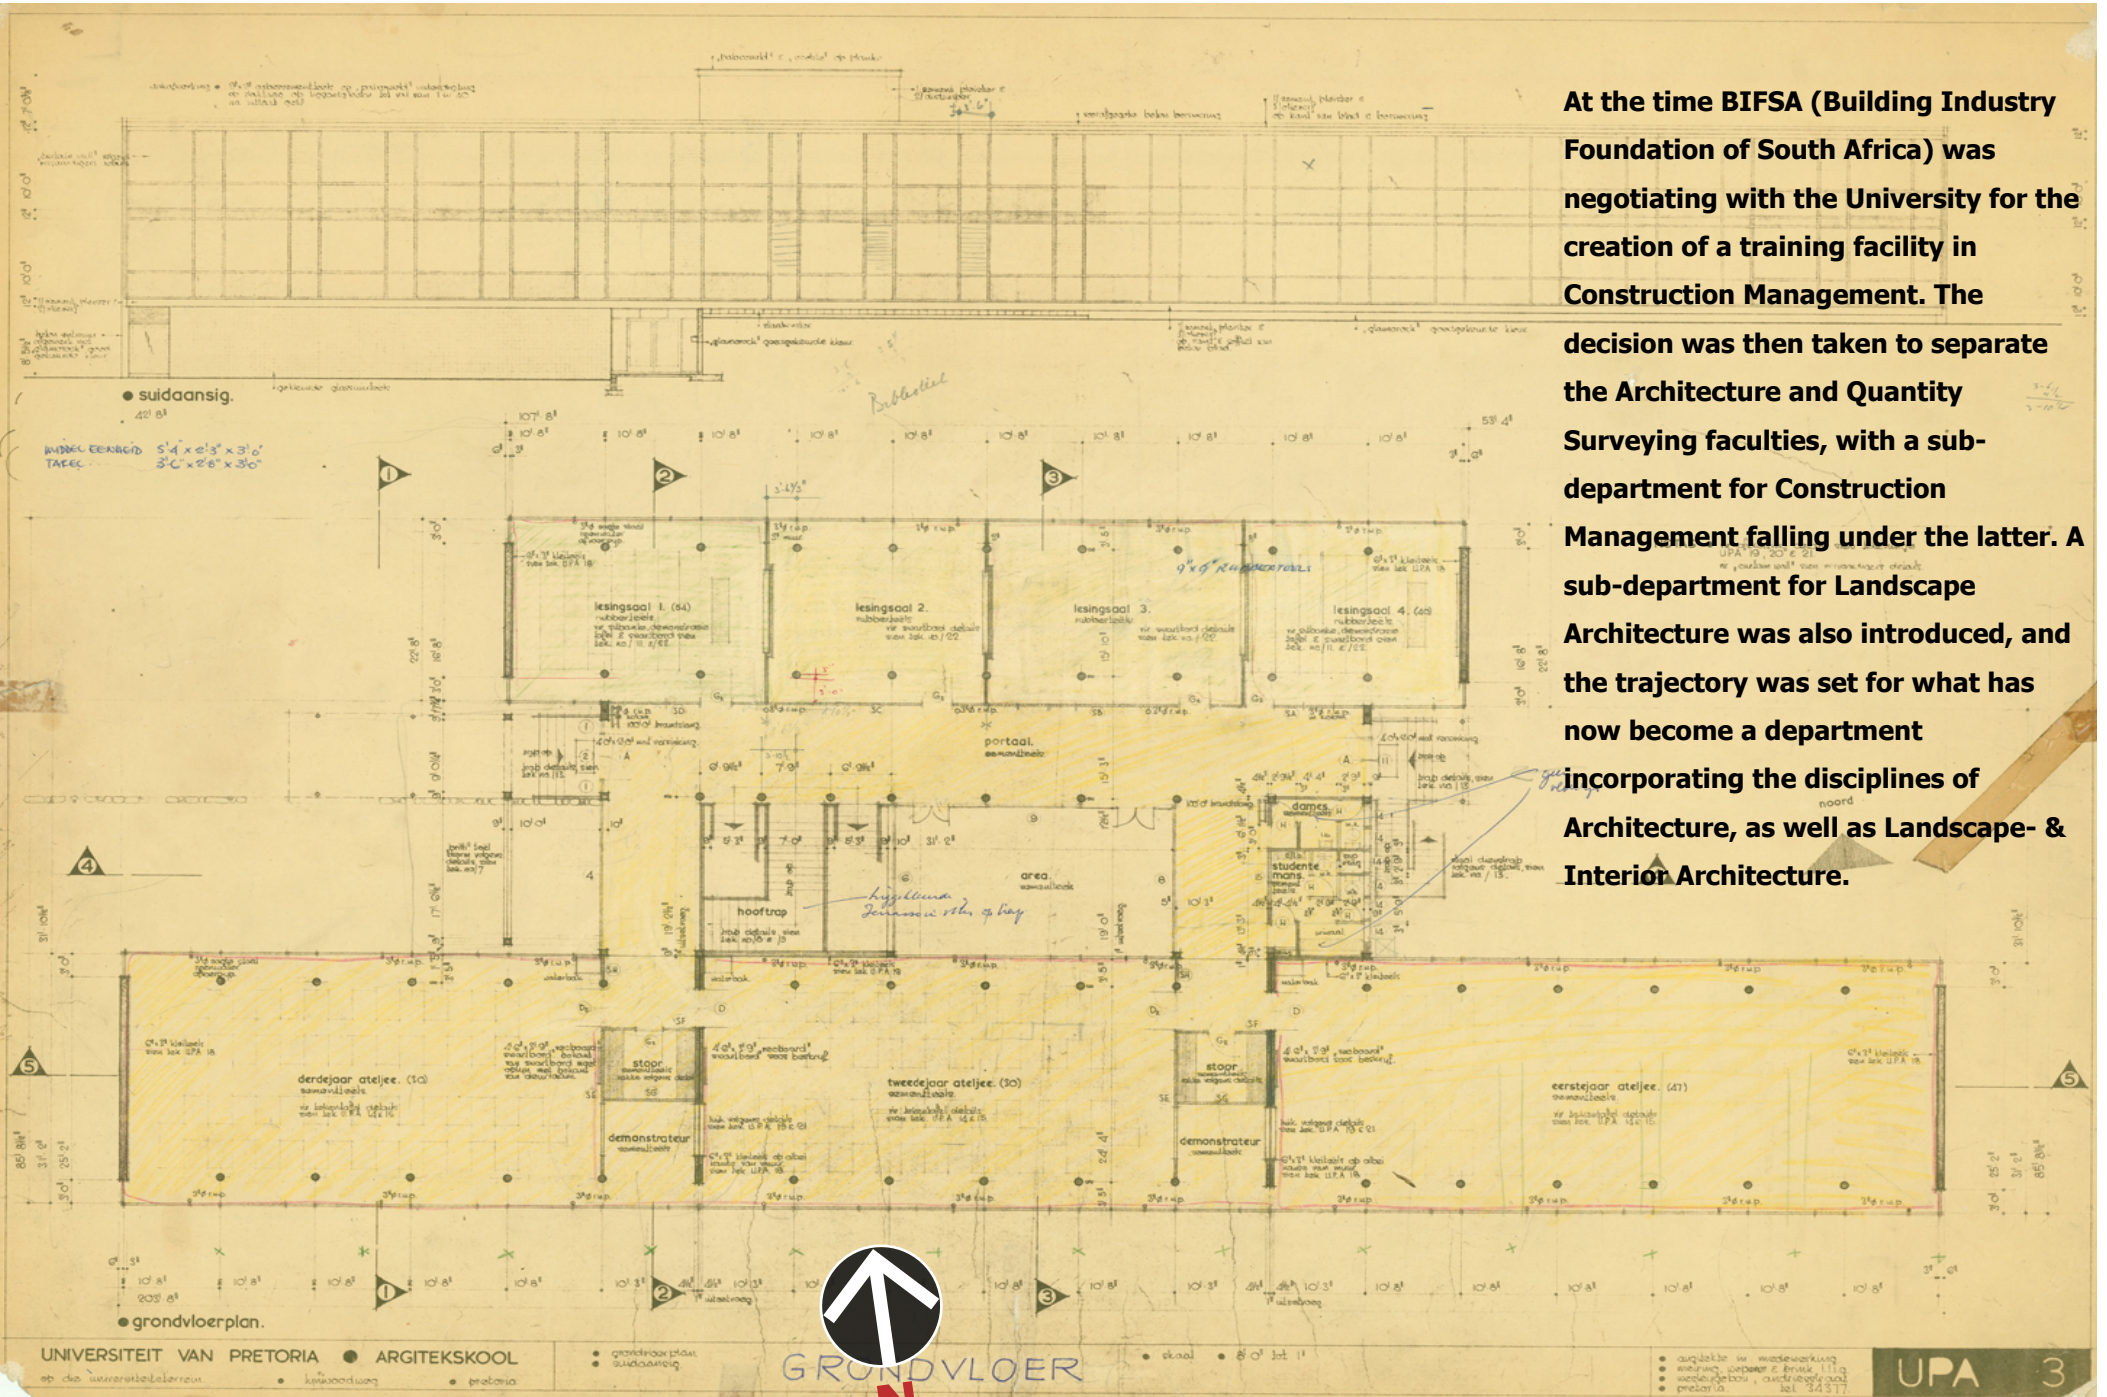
Ground Floor Plan - drawing no. UPA 3 (UP School of Architecture)
